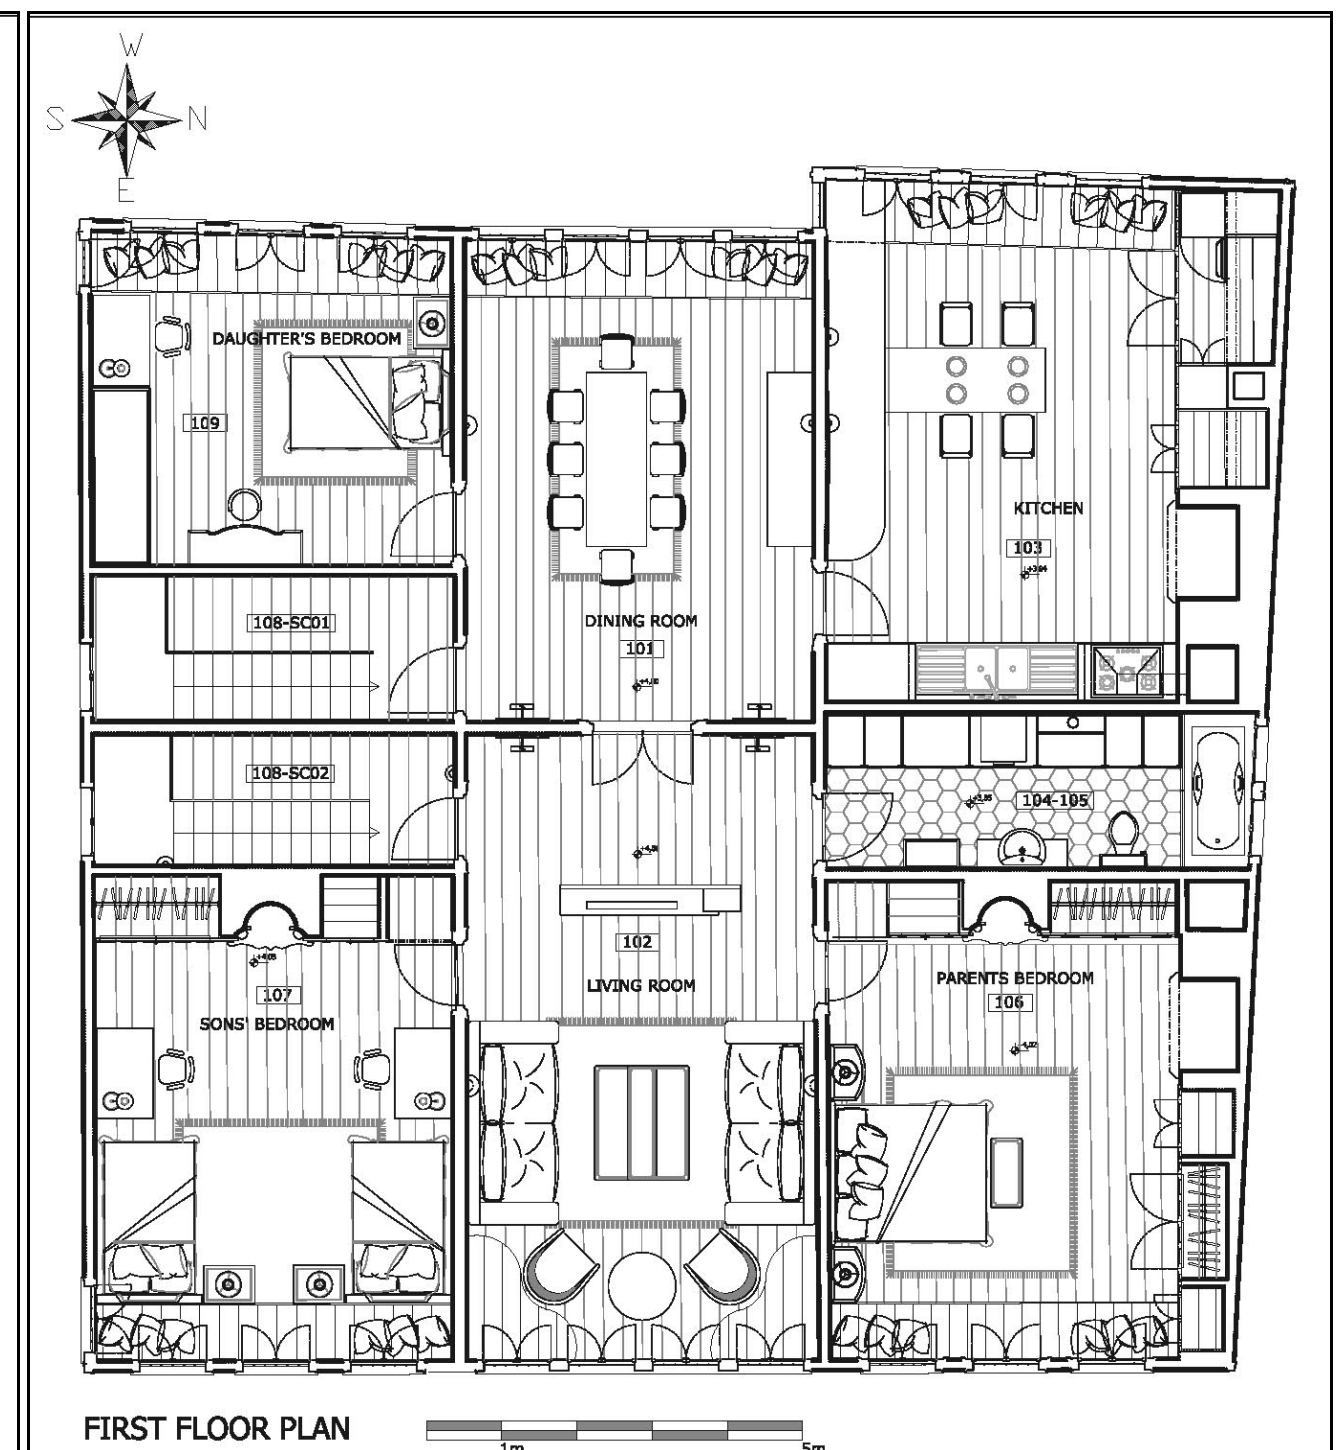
Restoration Project – First Floor Plan: 1/100 (Presented in 1/50 at Jury)
